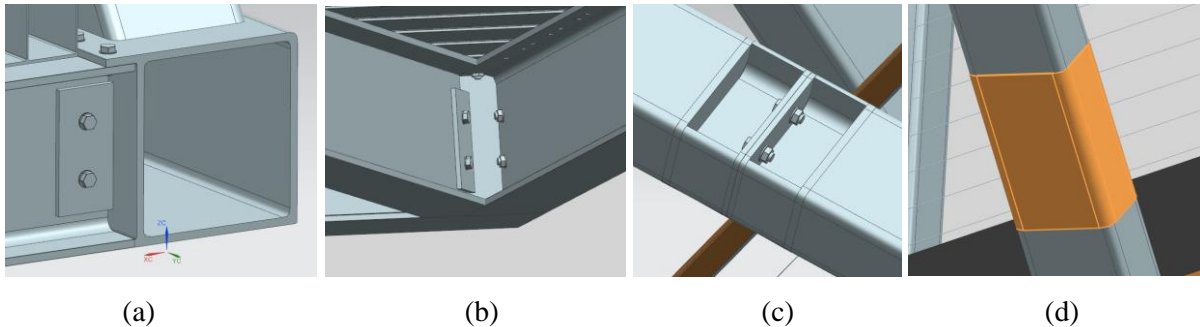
Connections and splices: a) Lower chord – I-beam b) Lower chord – I-beam diagonal c) Truss diagonal splice without non-structural cover. d) Non-structural cover (marked with orange).
